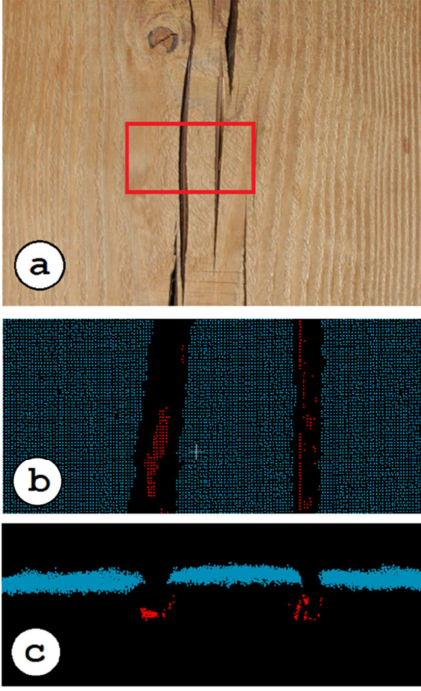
Example of points inside a crack that may remain after segmentation. a) Cracks in the beam. b) Plan view of the point cloud (red points are cleaned by fitting suitable polynomial surfaces) c) Profile view of the point cloud.
